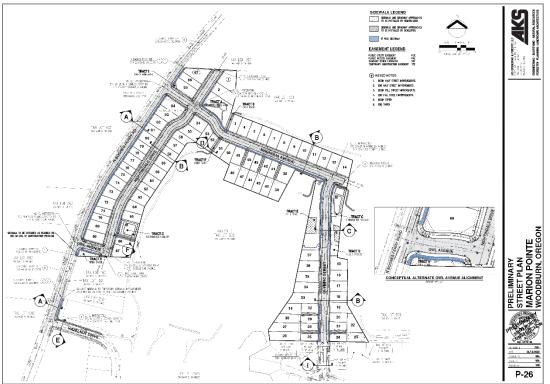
Site Plan Sheet P-26 Sidewalks (blue: min 8 ft wide); see Attachment 103 for full size
